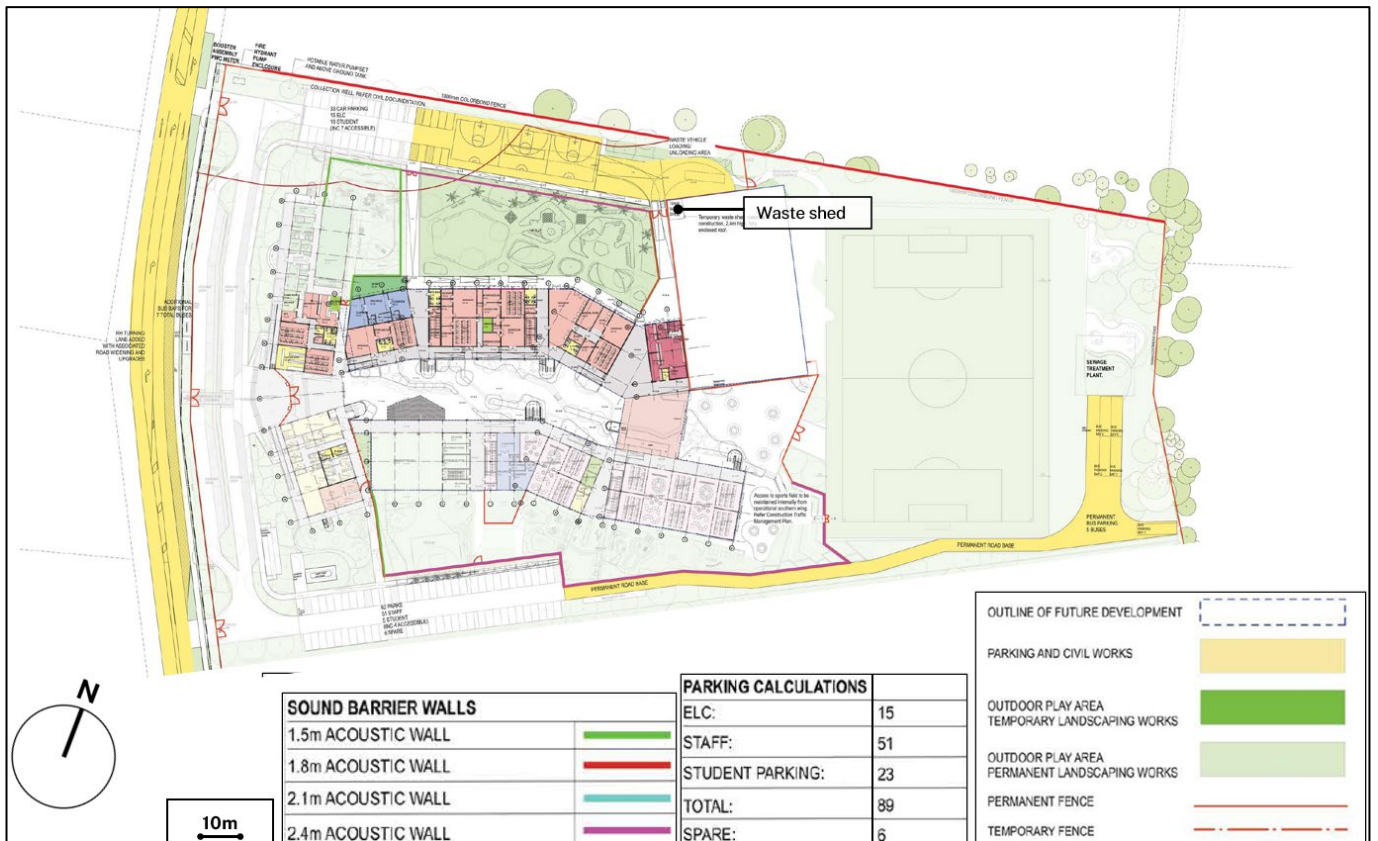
| Stage 3 Ground Floor Plan (Source: Applicant's AR, 2024)
